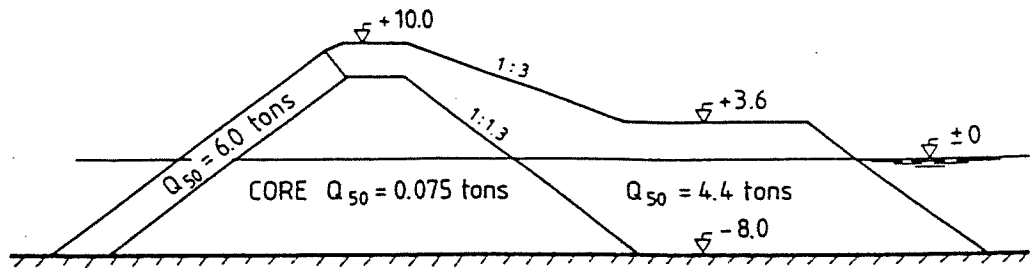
Extension of breakwater at Årviksand, profile of breakwater trunk section. All measures are in m.
